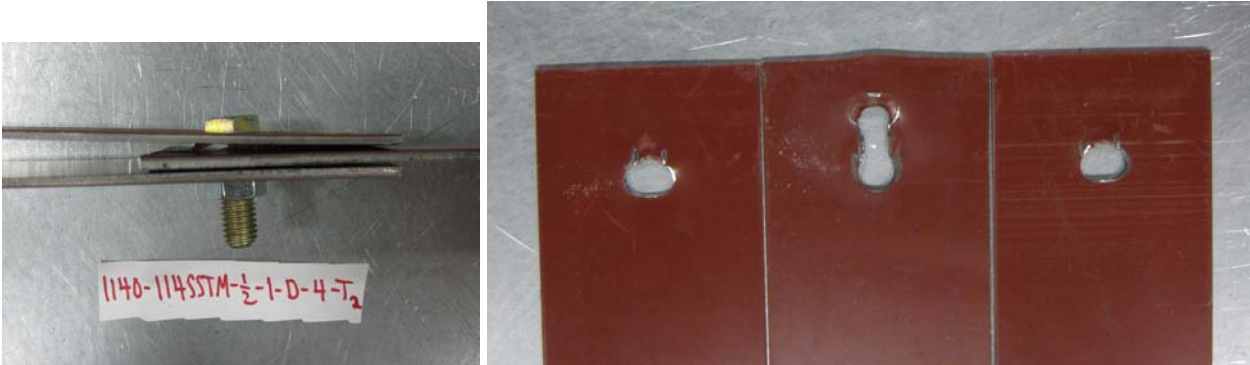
Bearing Failure of Test Specimen 1140-114SSTM-1/2-1-D-4-T2
